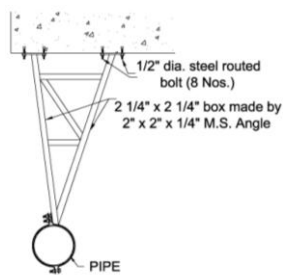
Pipe support at the discharge line of the PP2 from the West wall
